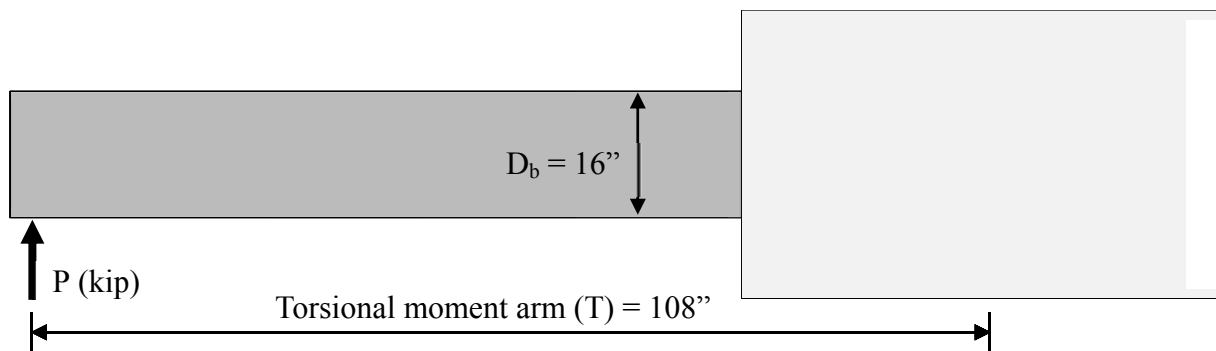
Front view of test apparatus with slip joint section and dimensions
